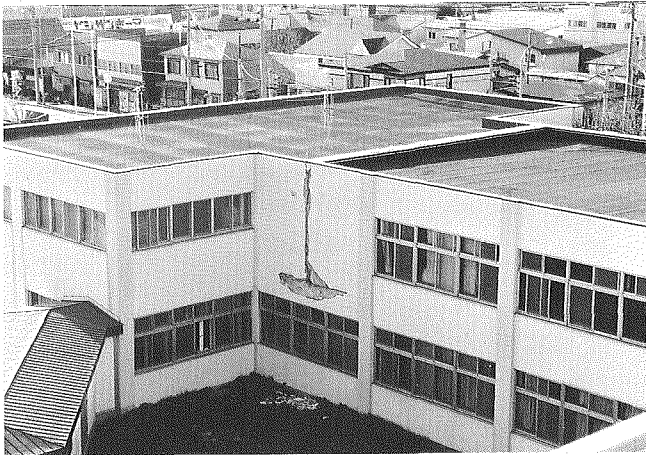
Failure at joint of low-rise parts (Nemuro Hospital)
